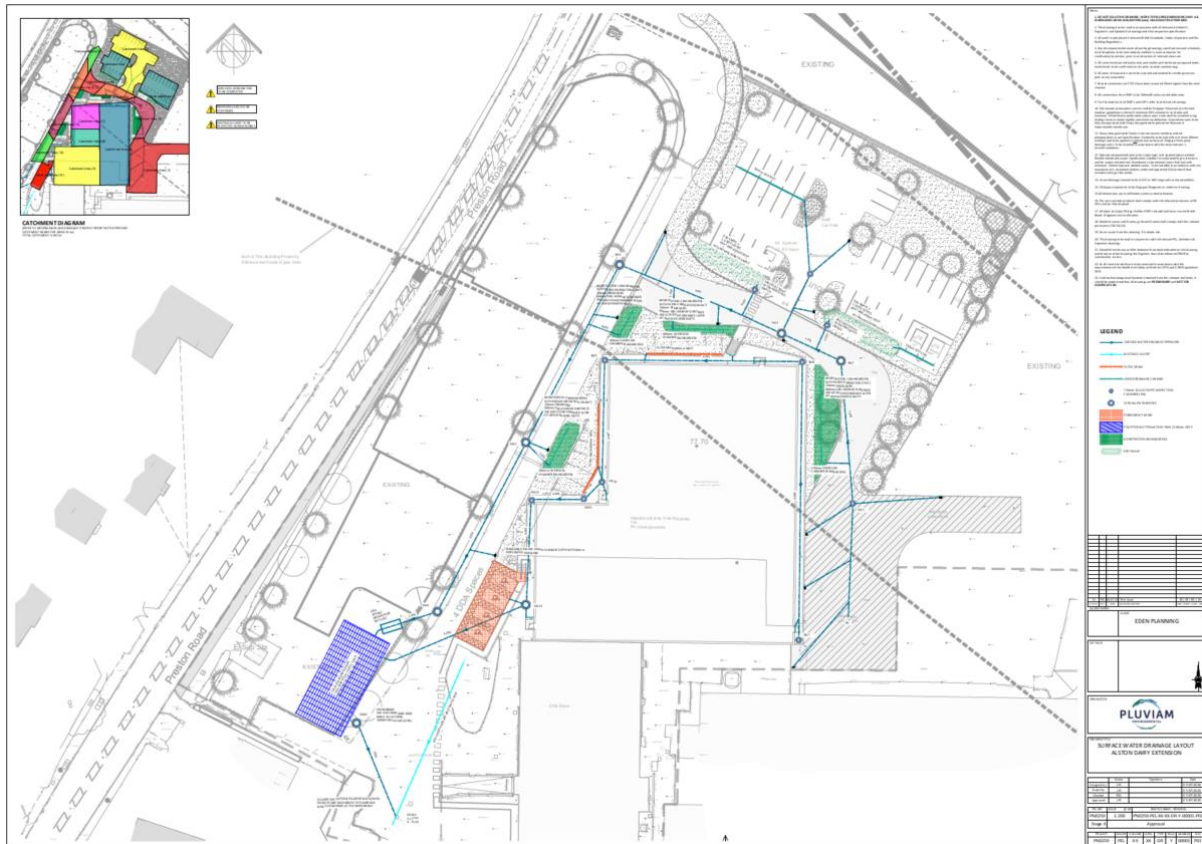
Outline drainage design and details (available full size in Appendix G)
